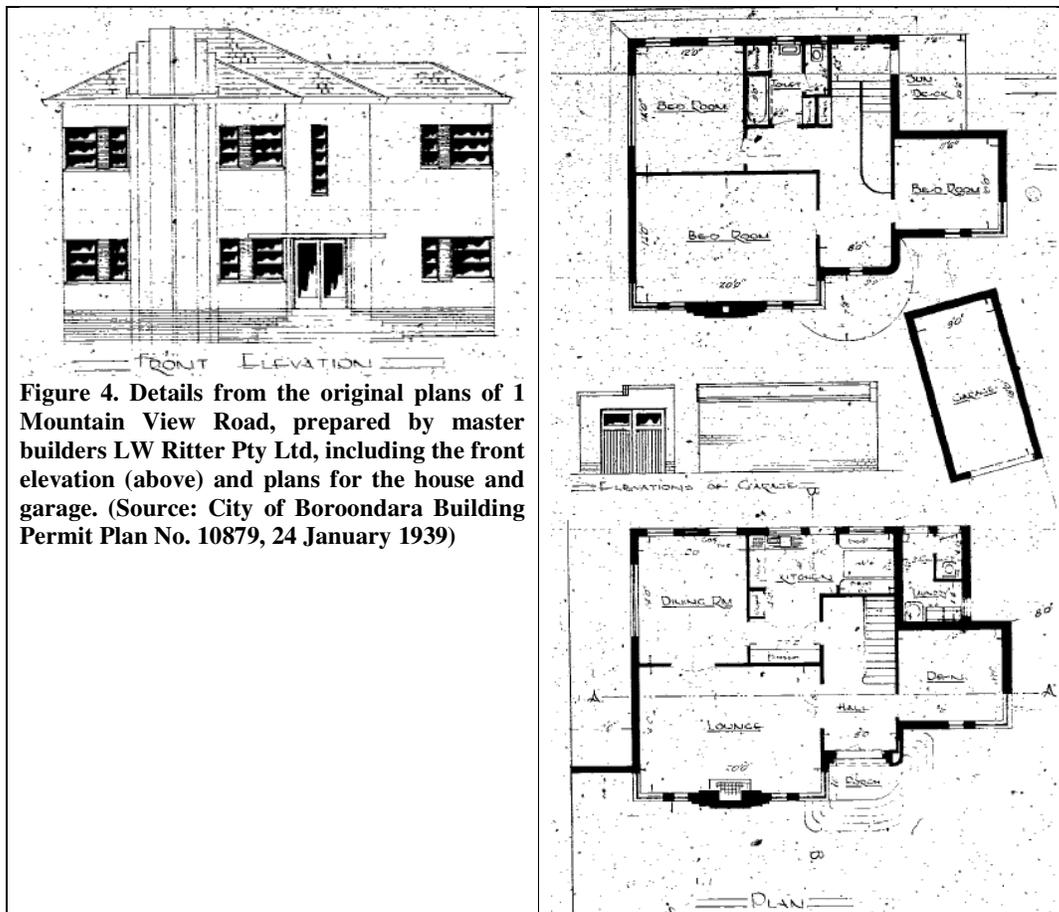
Details from the original plans of 1 Mountain View Road, prepared by master builders LW Ritter Pty Ltd, including the front elevation (above) and plans for the house and garage. (Source: City of Boroondara Building Permit Plan No. 10879, 24 January 1939)
